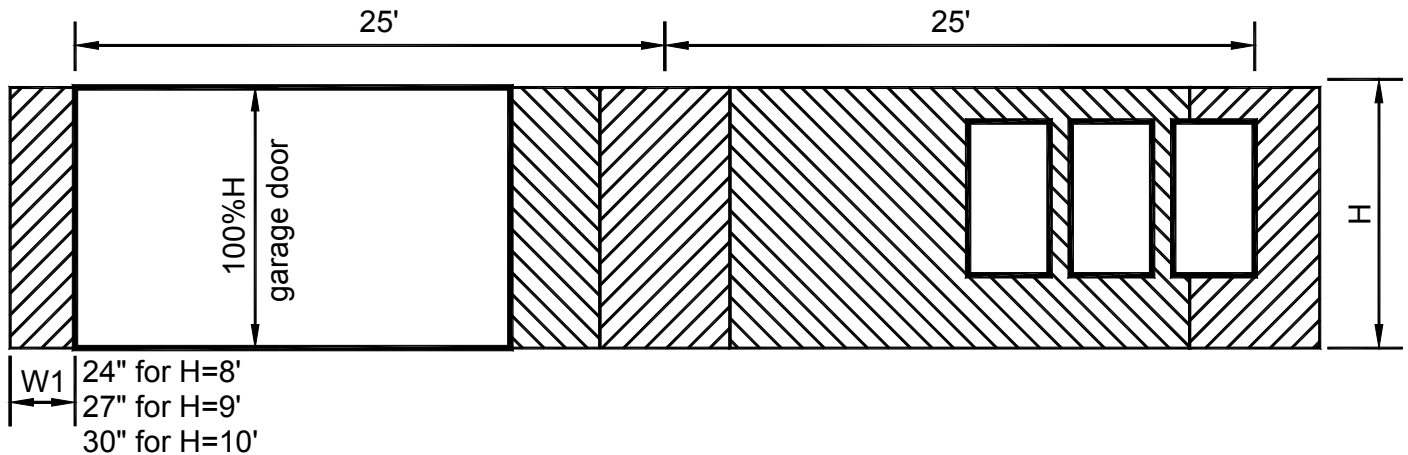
WIDE GARAGE DOOR NEAR CORNER
